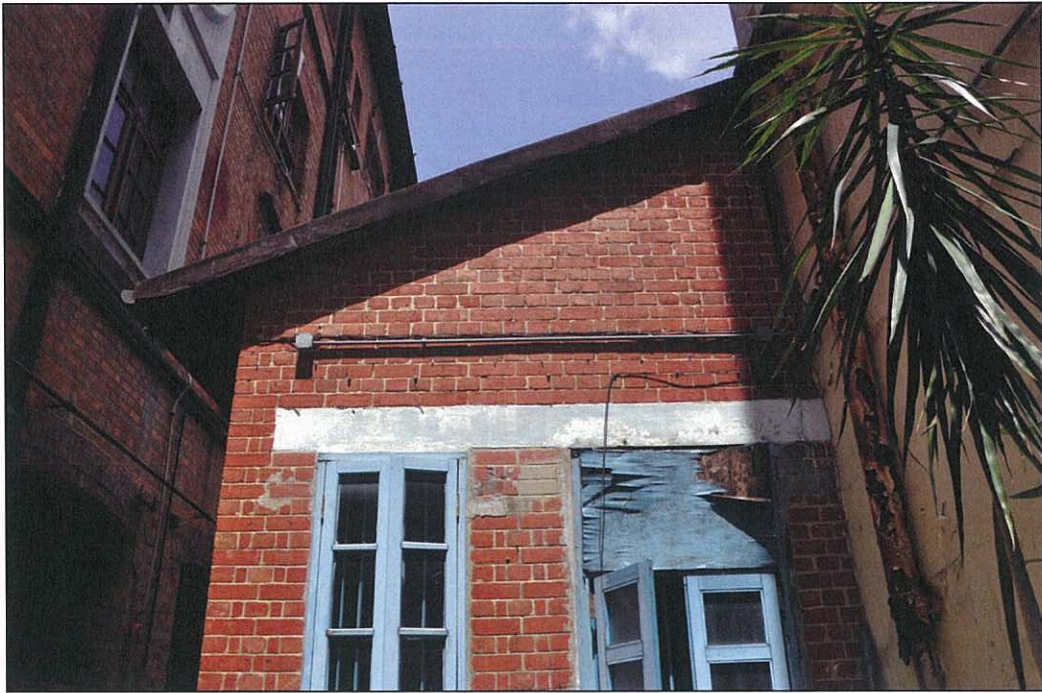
Brick end wall, upper part (2011/08/13)
